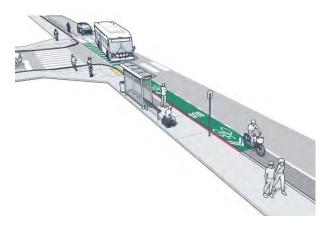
Unprotected mixing zone between separated bike lane and transit stop.
